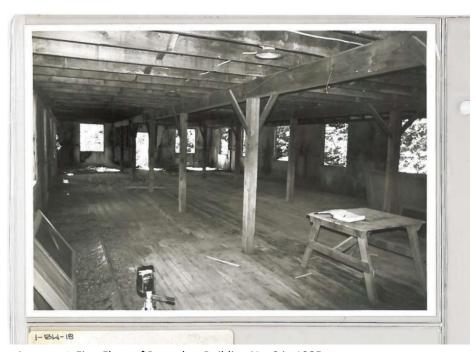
First Floor of Barracks - Building No. 9 in 1985
